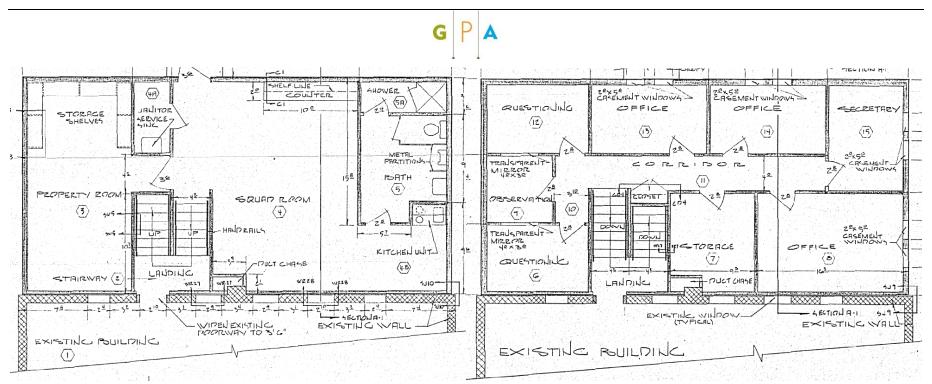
(LEFT): Architectural drawing for first floor of the 1980 addition (A.J. McMurry Company, Sheet 2).
